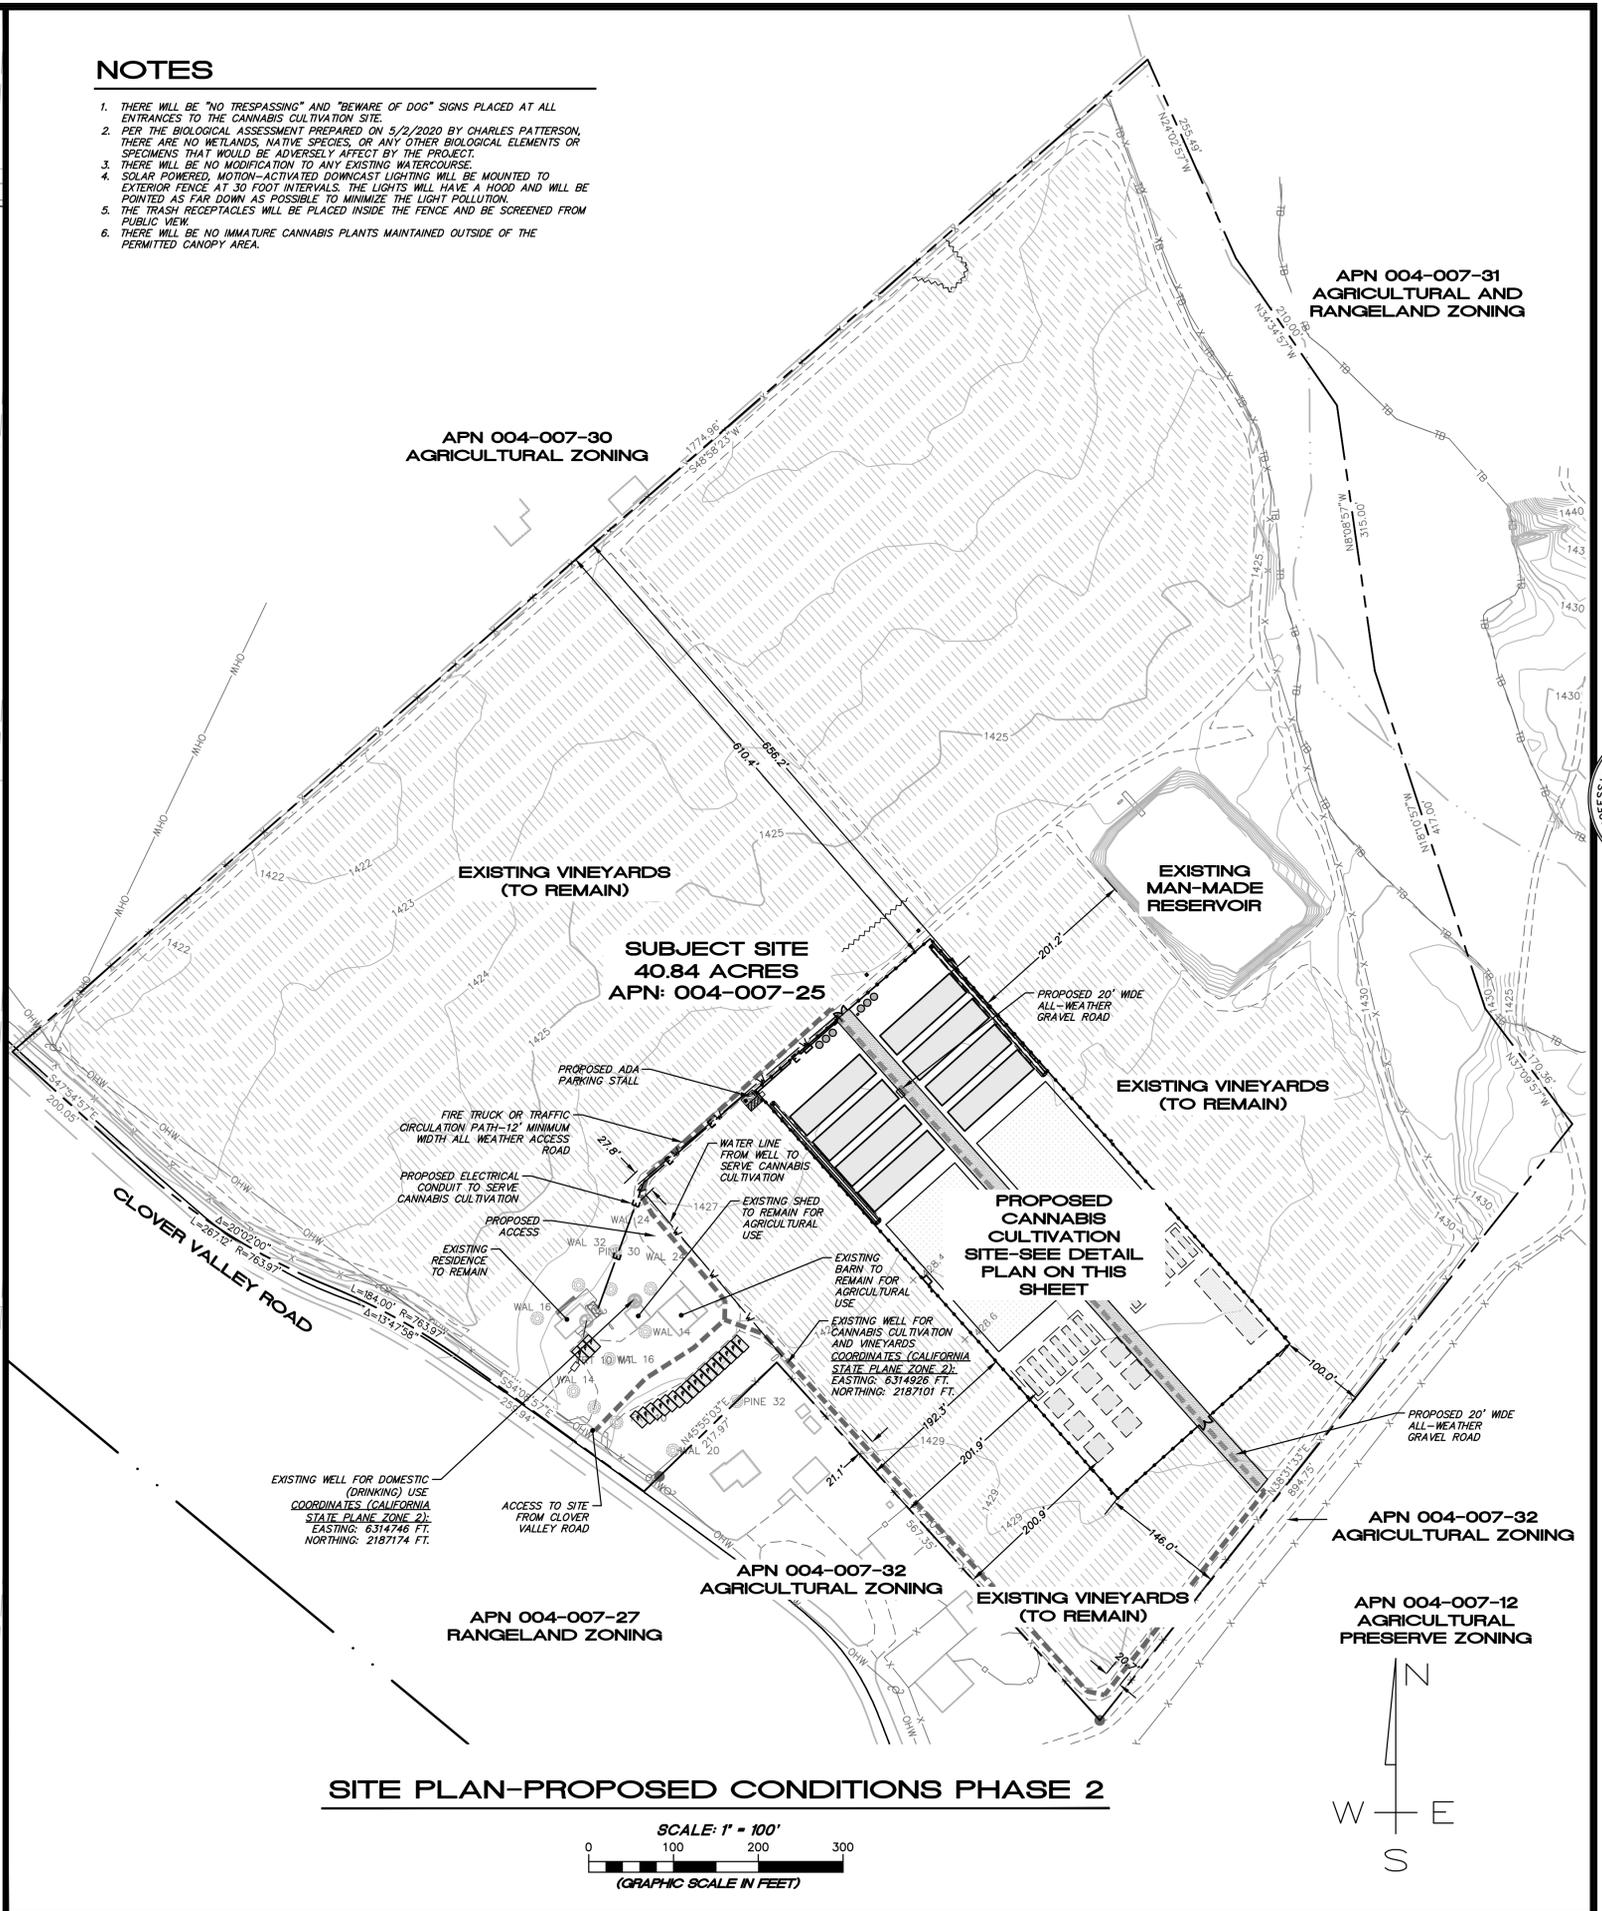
DETAILED SITE PLAN-PROPOSED CONDITIONS PHASE 2
